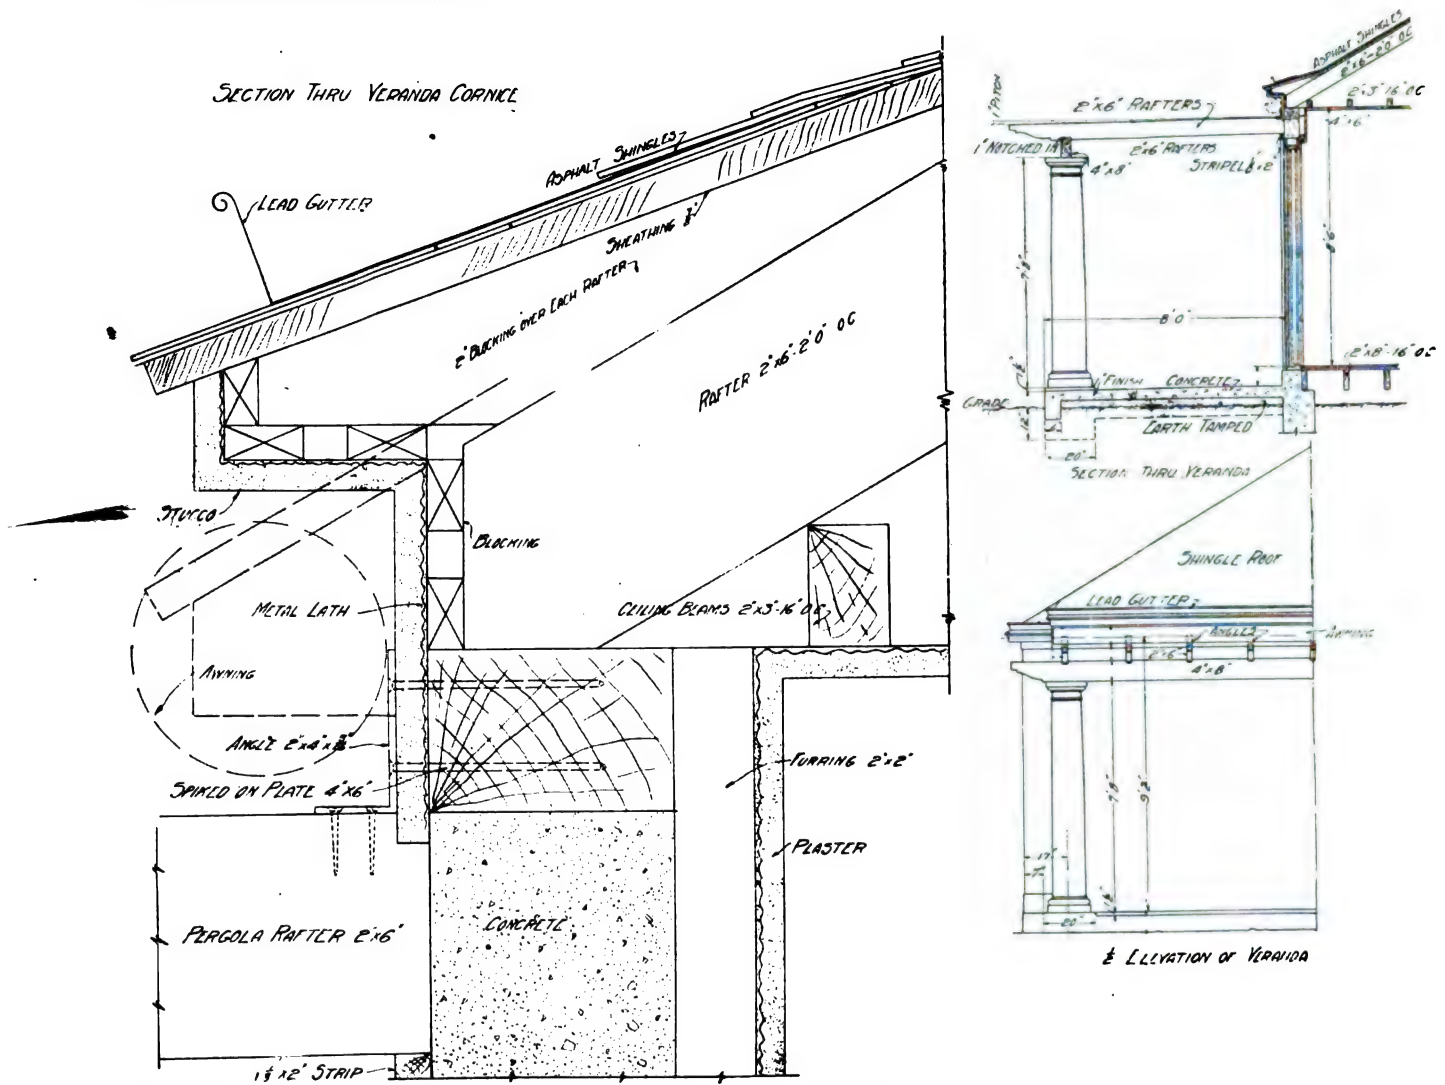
DETAILS OF CONCRETE COTTAGES—N. K. VANDERBECK, ARCHITECT
